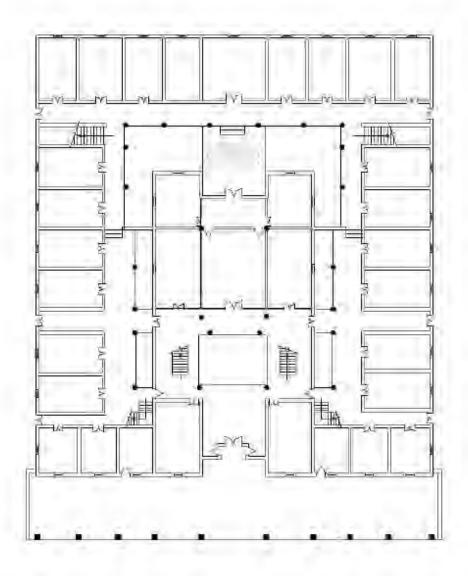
Ground floor plan of a Western residence in Quanzhou (Liu 2011)
